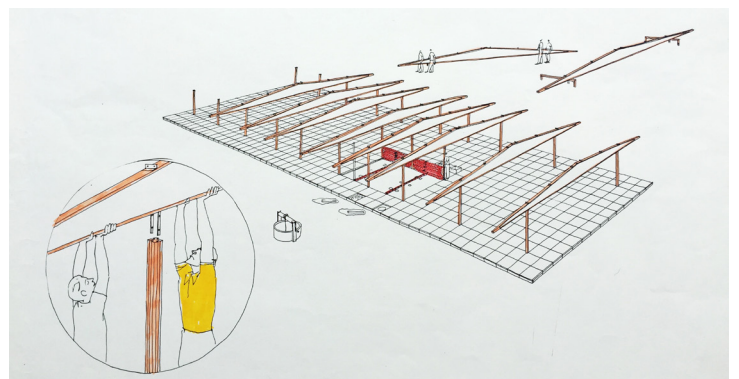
Transitory school's wooden prototype. Lelé, 1983. Drawing board showing the building's assembly process. Detail of the connection between the cantilever trusses and the column. Arquivo João F. Lima, Salvador
